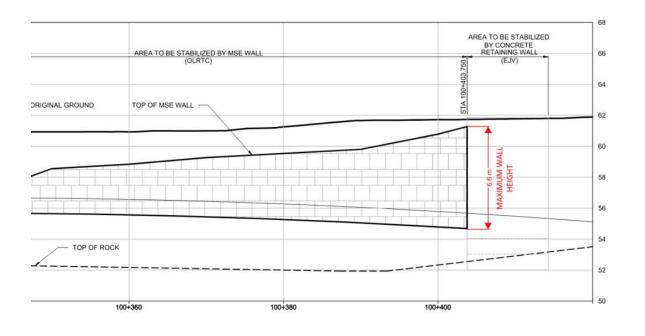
Extract from LRT drawing REH-87-2-WPTU-DRD-1103 Rev 2, showing MSE footing elevation and maximum height
